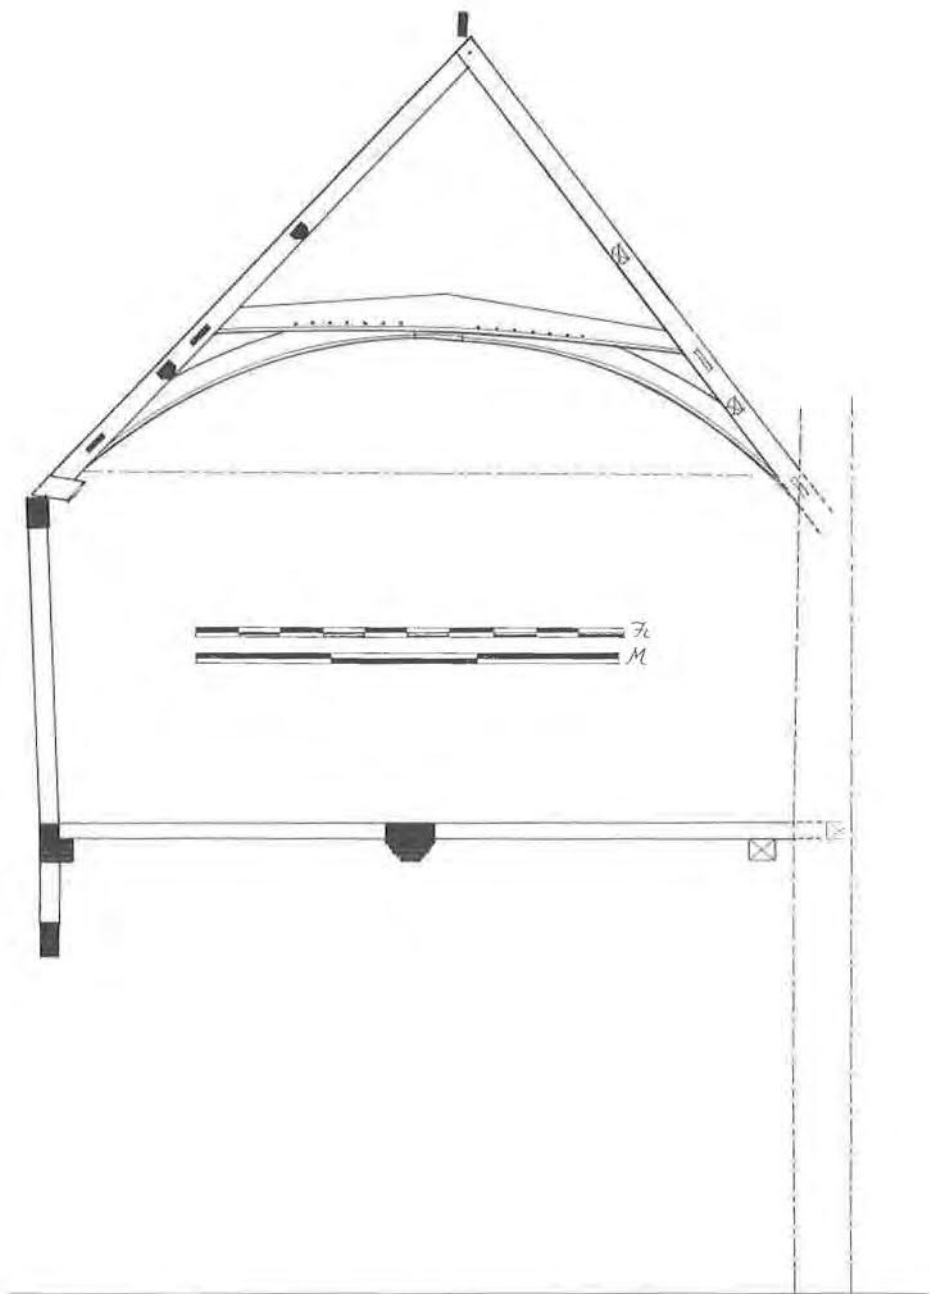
Section D, looking south, showing inserted ridge and sunken W side of truss
